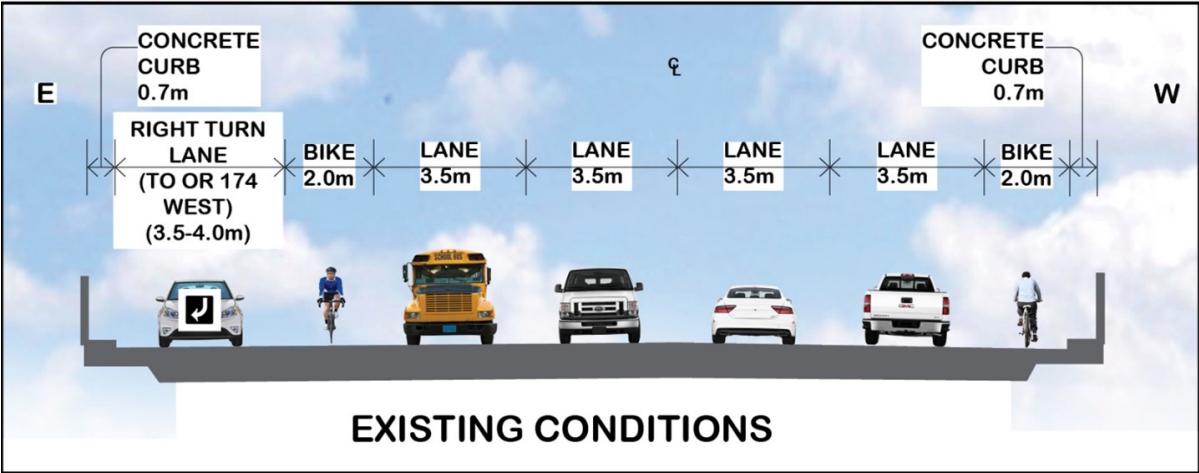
Existing Blair Road/OR174 Bridge Cross-Section
